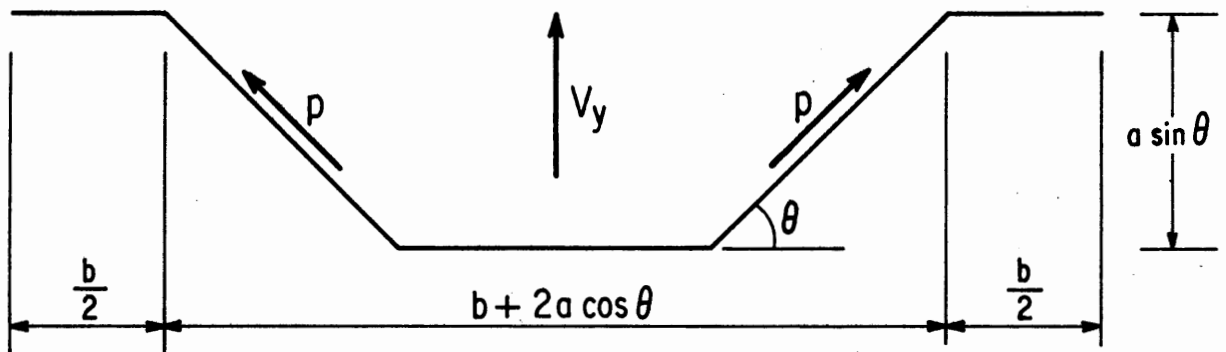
PLAN VIEW OF TYPICAL ELEMENT OF THE CORE
